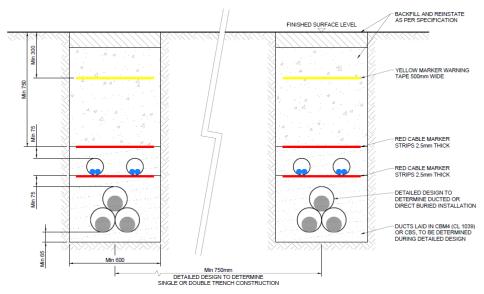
Typical Cable Trenching Cross Section – Ducted Trefoil Arrangement
